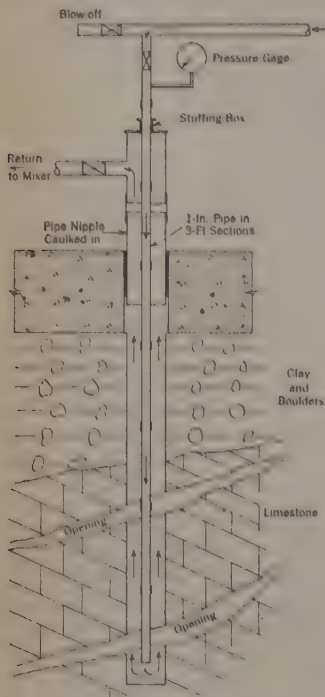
FULL CIRCULATING ARRANGEMENT FOR STAGE GROUTING OF OVER-BURDEN AND ROCK
